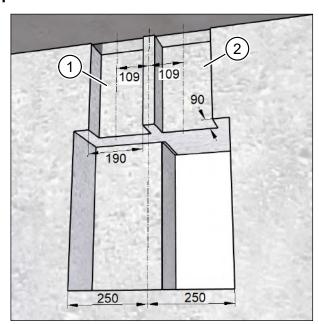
Chasing out channels for flexible pipe connections, dimensions in millimetres
